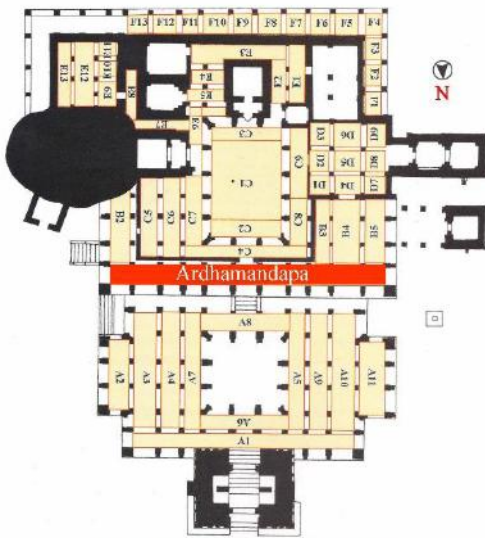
Temple Ceiling Plan of Murals at Lepakshi
